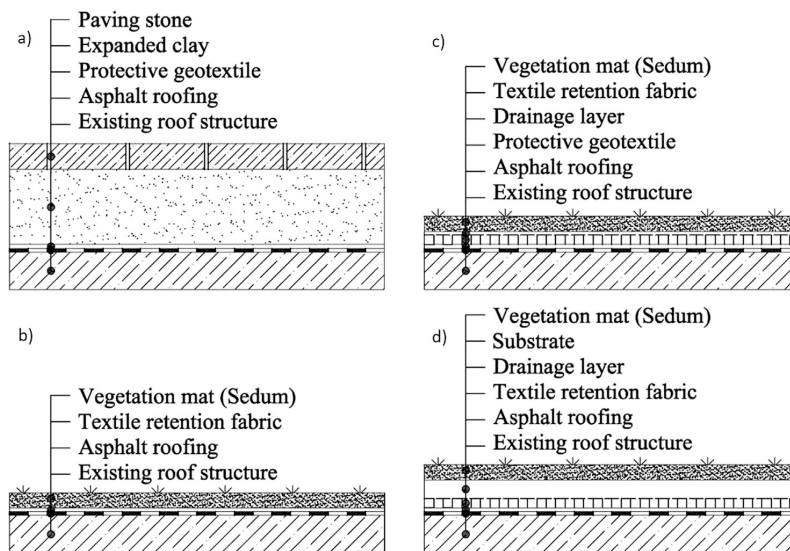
Components of various rooftop configurations in a cross-section: a) Non-vegetated roof (HOV1, LAB6); b) Green roof Type A and B for sloped roofs (RIS1, BER1, SAN1, BER4, SAN3); c) Green roof Type B for flat roofs (HOV3); d) Green roof Type C for sloped roofs (RIS3, BER3, SAN2).
